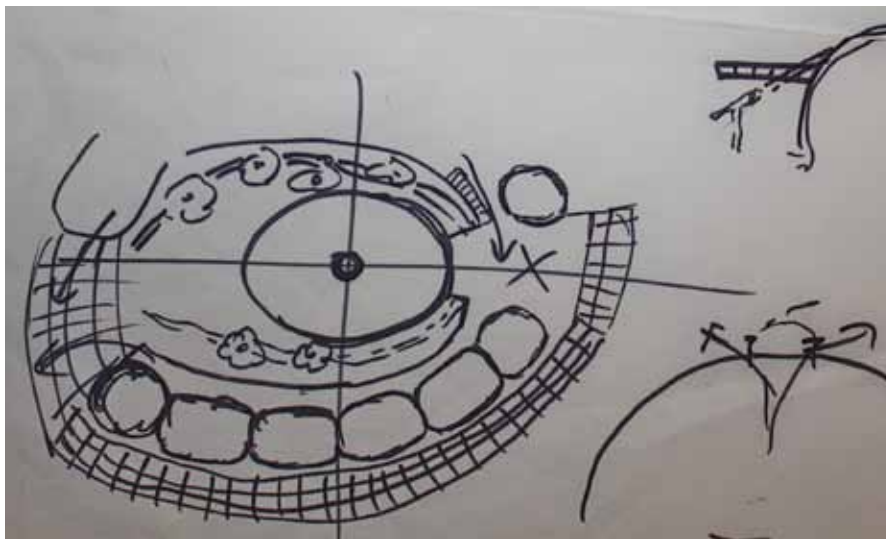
Sketches imagining circulation and roof structure for south portion of building
